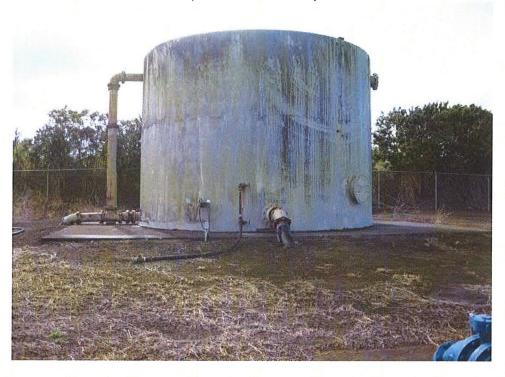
Hamakuapoko Well No. 1 Storage Tank (South View)
